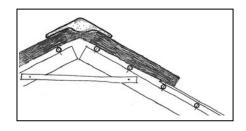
Detail of typical hybrid roof of thatch and metal sheeting
